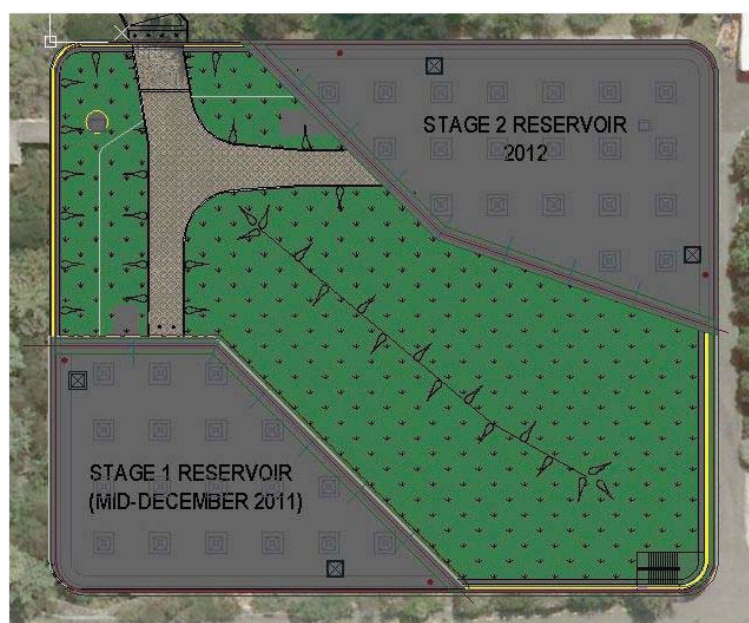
Huntsbury No.1 Reservoir – proposed site reinstatement.
